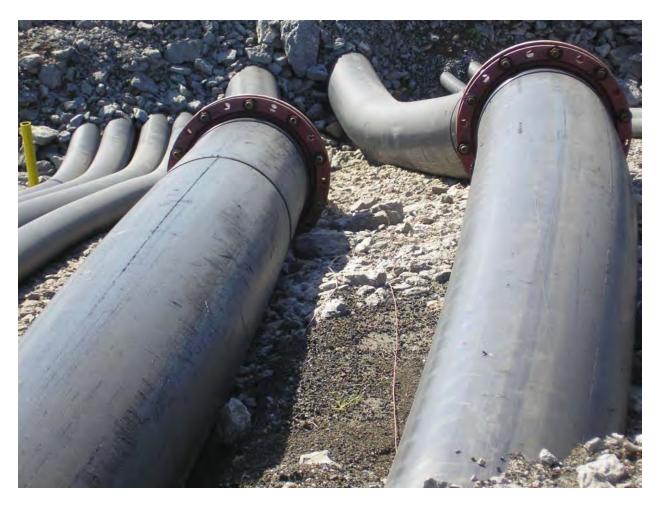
Main Pond: Crest and CCW Pipes into Auxiliary Pond at South End of Main Pond
